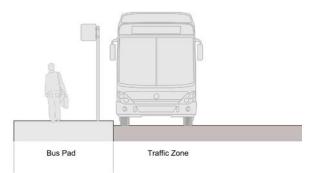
// RURAL ACCESSIBLE TRANSIT STOP
